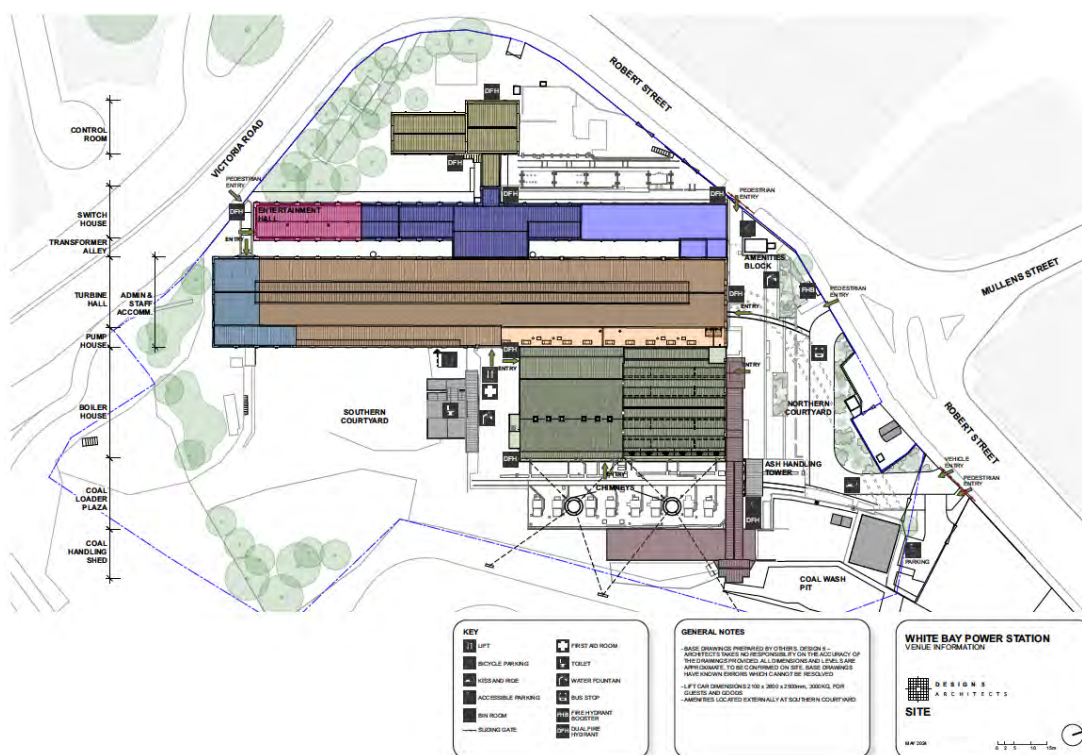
White Bay Power Station Venue information – Ground Floor (Design 5 Architects)
